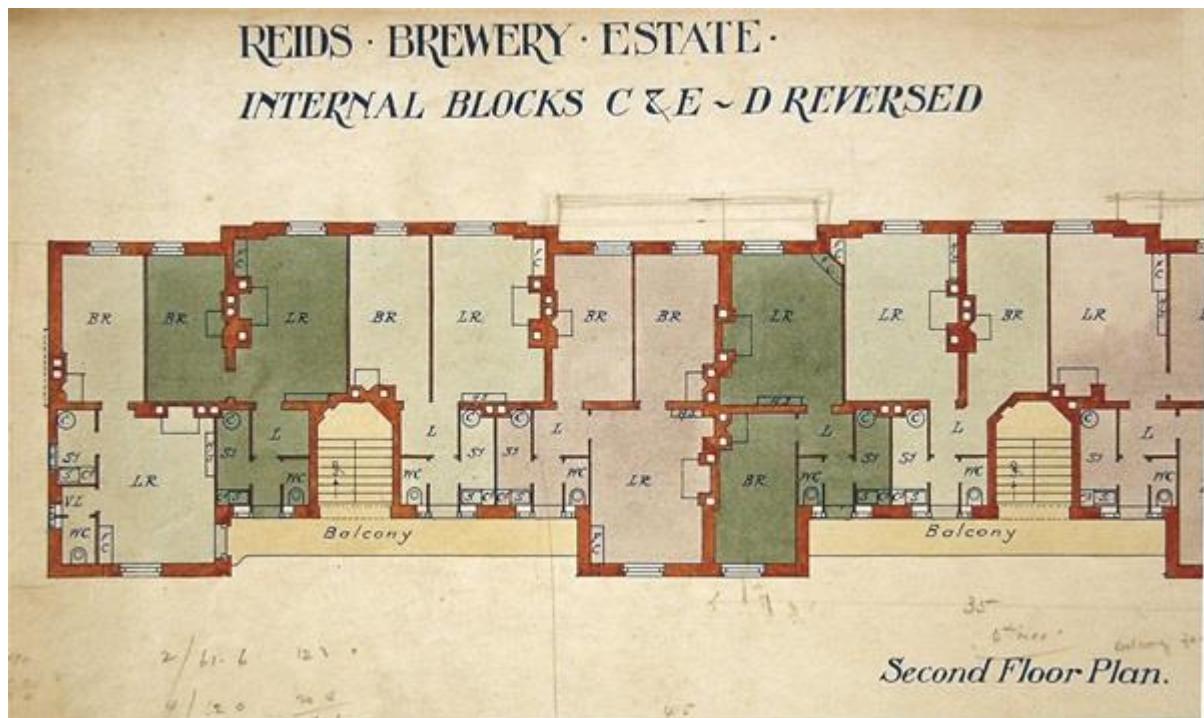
A plan of one of the nearby Bourne Street buildings (1903-5) showing an almost identical layout to the later Union Buildings (LMA ref: LCC/AR/HS/03/059)
